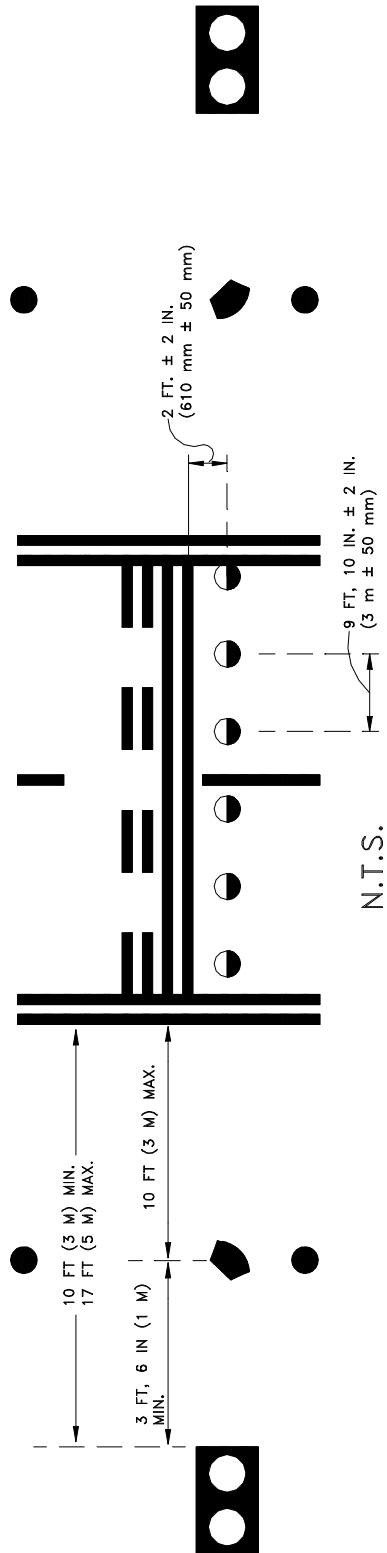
TYPICAL LIGHT BEAM ORIENTATION FOR IN-PAVEMENT RGLs AND STOP BARS
